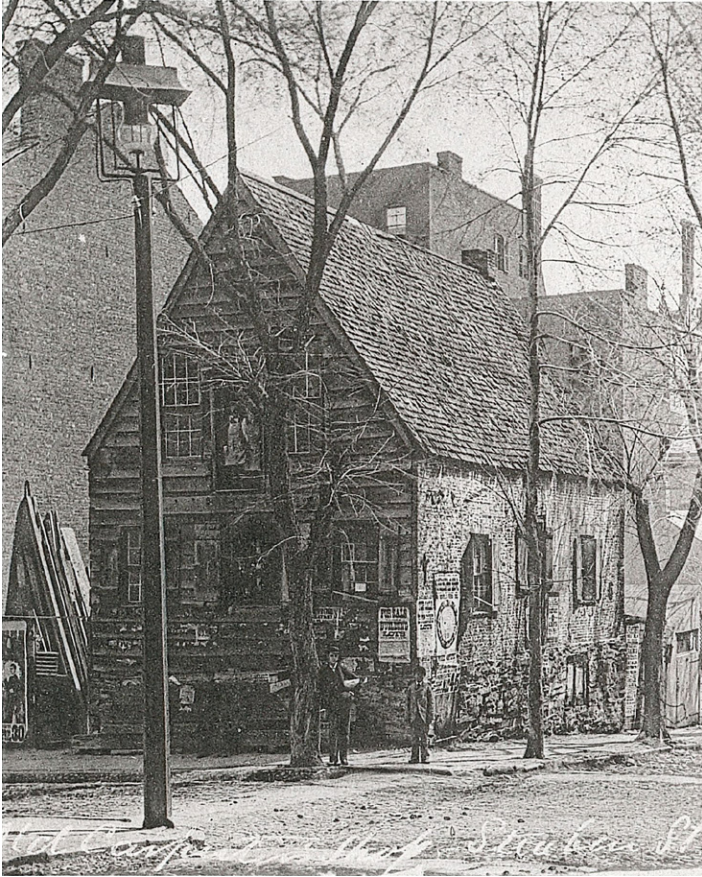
Photograph of the Glen house by J. W. Mac Murray, 1883 (Author's Collection). The south elevation retains its brick veneer facing, held back by fleur-de-lis anchor irons. The high foundation may be an indication of lowering of the topography in the intervening years. This house and the other Glen house described in this article were both located on a portion of Albany's hill that was subjected to cut and fill operations during the early years of the 19th century. The roof was covered with wood shingles when this photo was taken.
